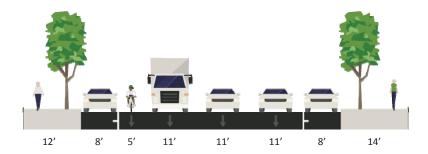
Jackson Street Typical Cross-Section, between Florida Avenue and Marion Street
